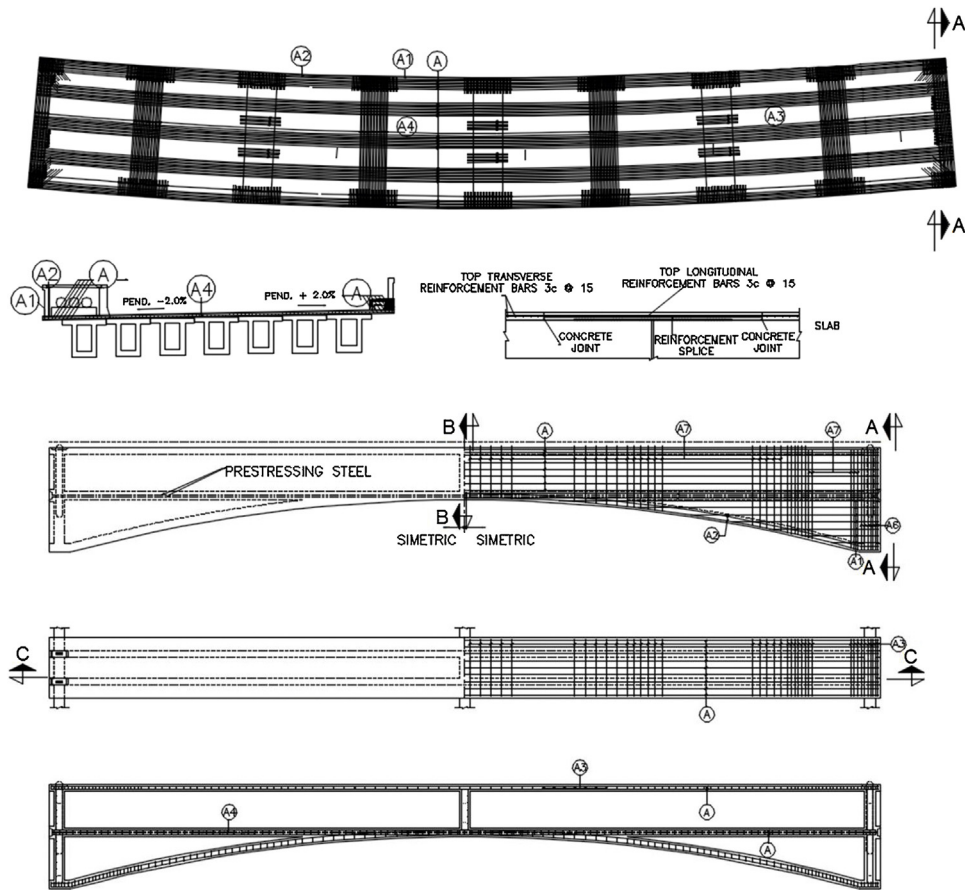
Superstructure details of the Progreso's new viaduct: above deck, below prestressed arched beam.
